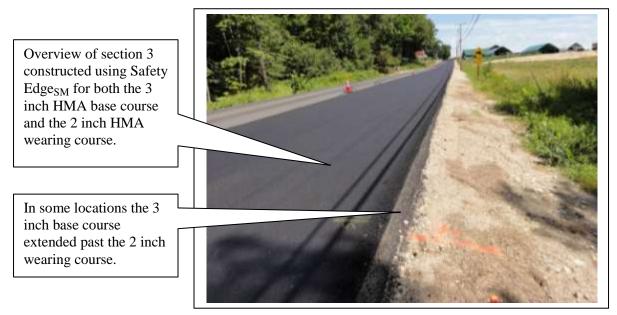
General overview showing the wearing course with Safety $Edge_{SM}$. Image taken facing the northbound direction around station 406+15, the end of section 3 (image shows the end of the section and the pavement north of the section).
